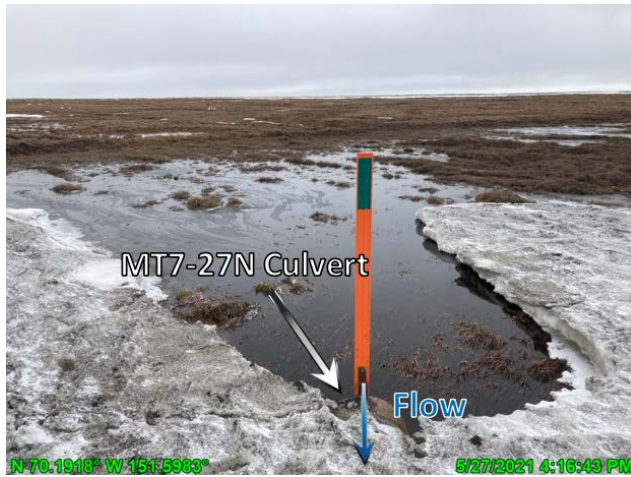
Flow through culvert MT7-27, looking north; May 27, 2021
